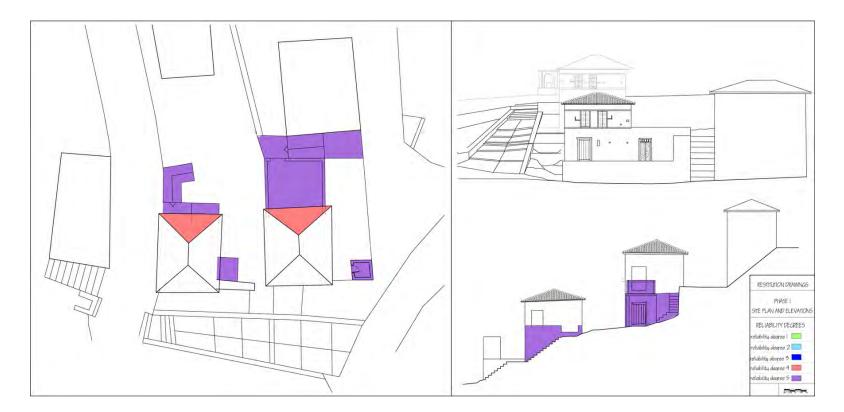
Restitution scheme - Site plan and elevations of the houses in the first phase
